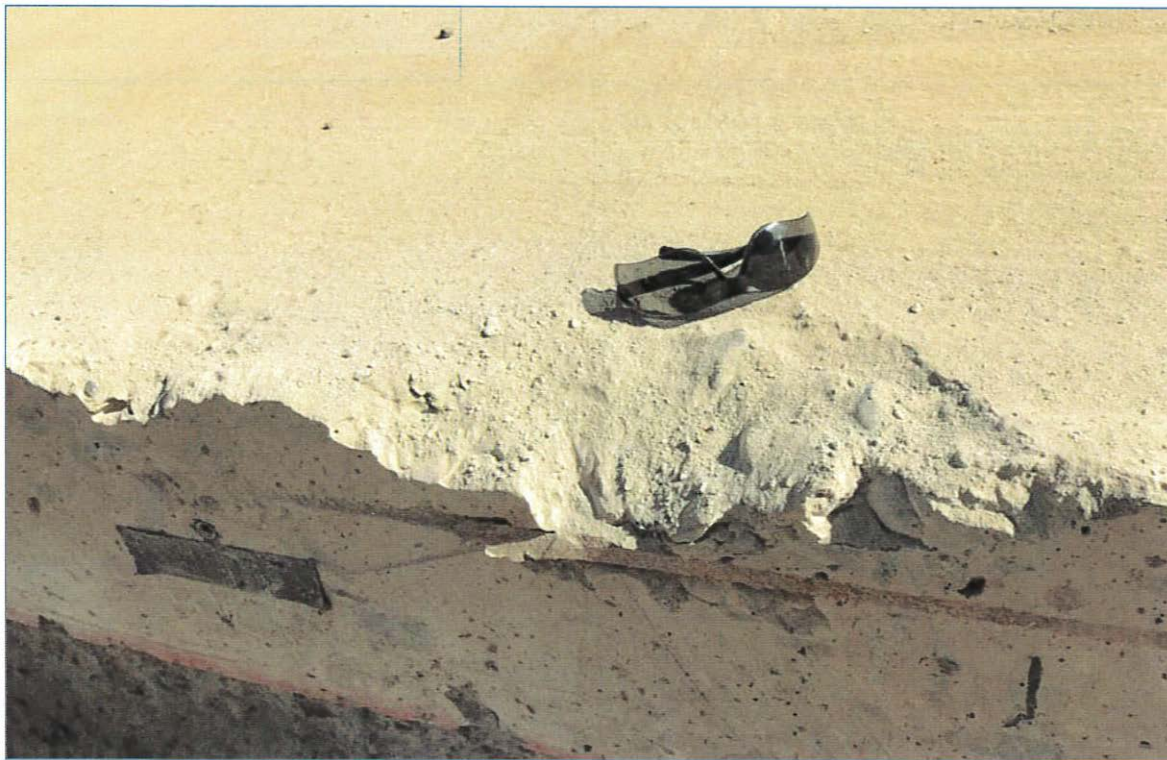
Photos of the downstream end of the existing chute slab showing spalls.
